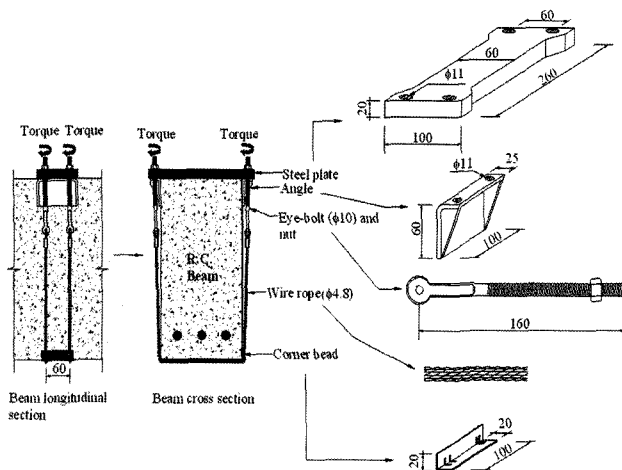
Details of developed wire rope units and strengthening technique (unit: mm)
